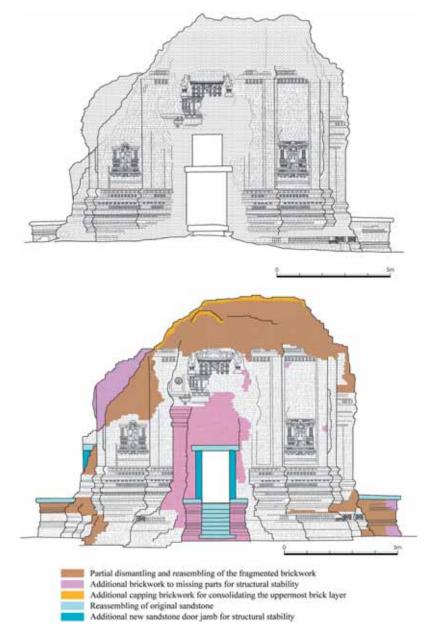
North elevation of the Central Shrine in Prasat Sambor (above: before restoration, below: after restoration).
